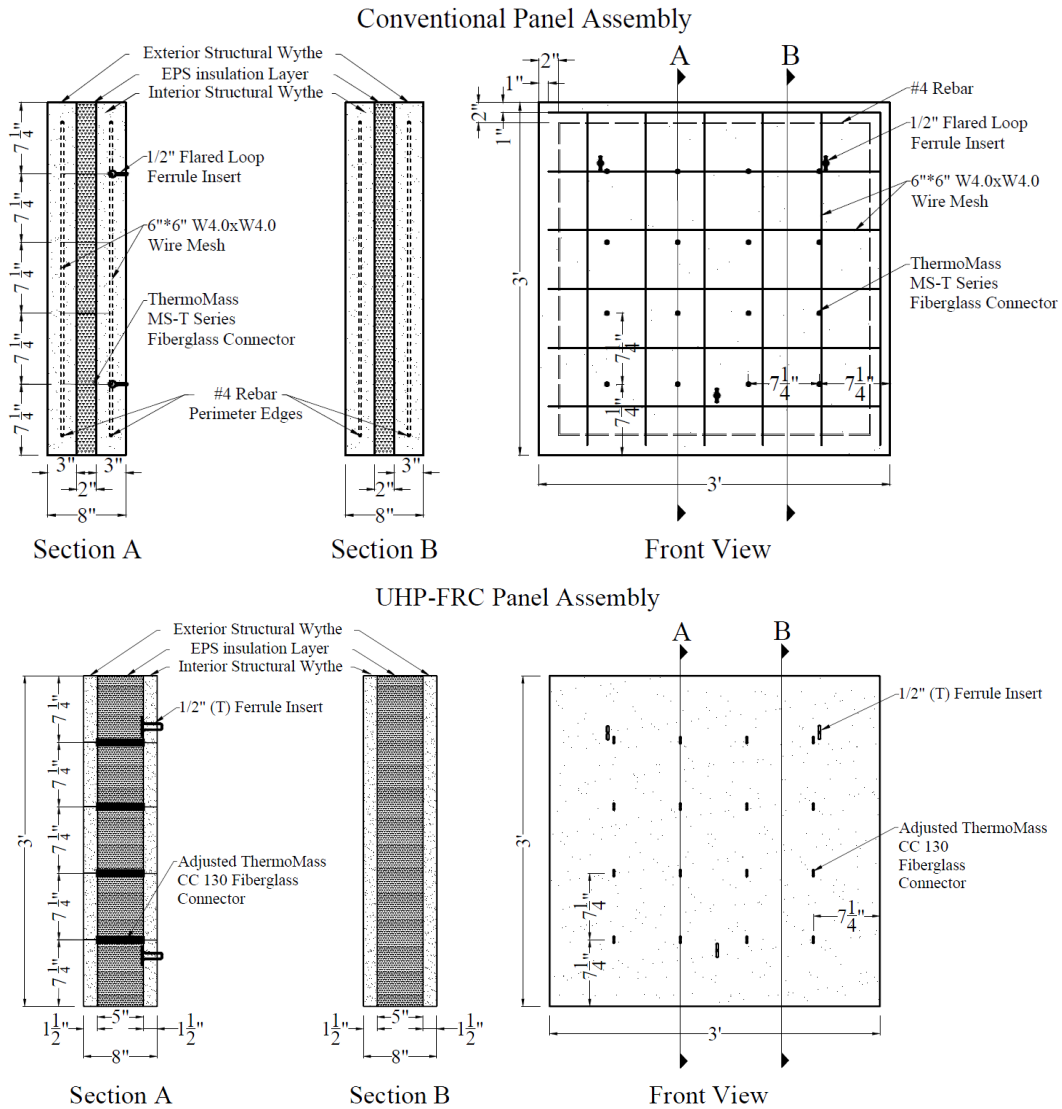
Conventional and UHP-FRC façade panels configuration (Section A, B, and front view)
